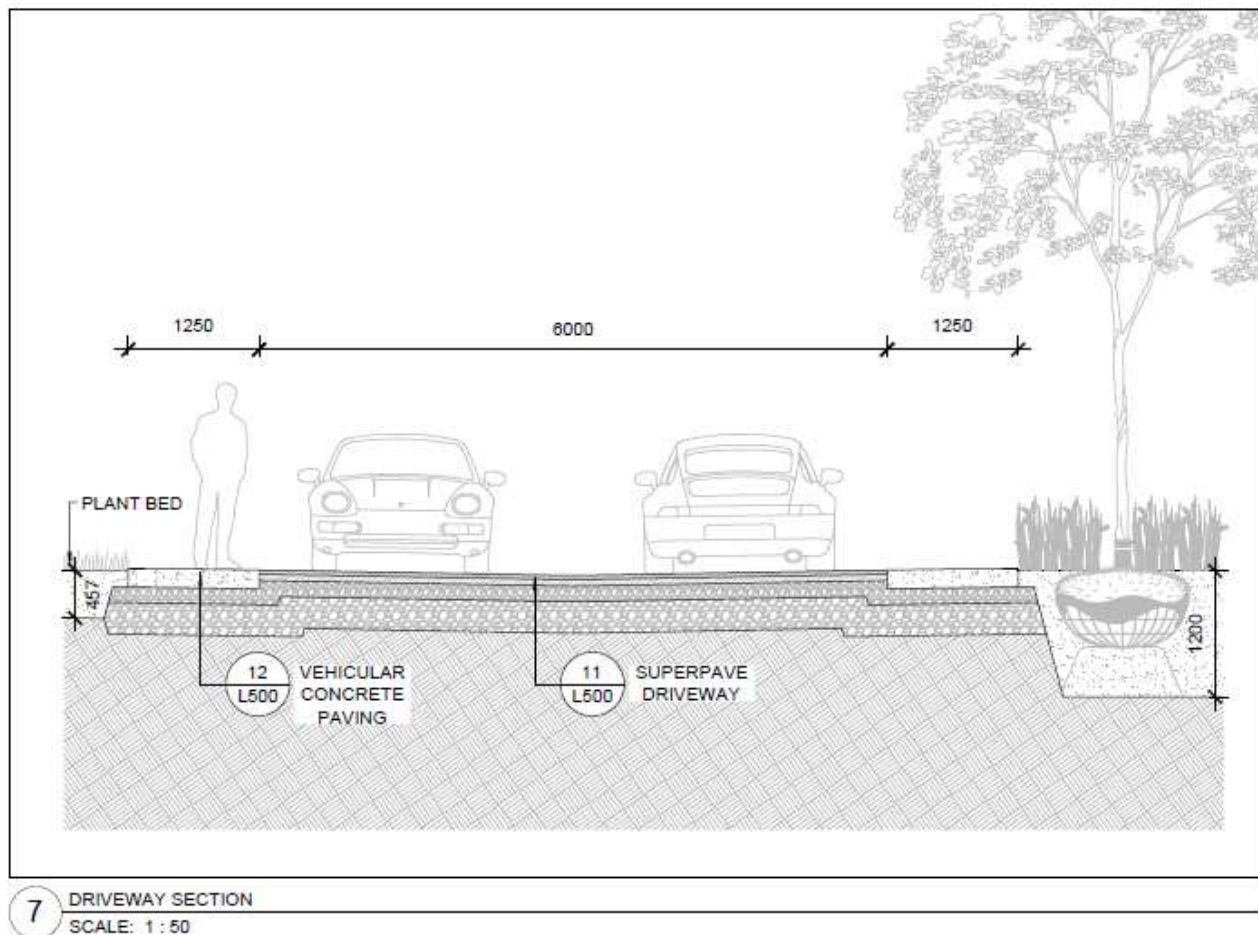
Cross section of the driveway at the entrance of the development. The woonerf measures 8.5-metres and is made up of two 1.25-metre vehicular concrete paving sections and a 6-metre superpave driveway. The woonerf narrows to 6-metres around the central landscaped area, where it is made up of two 1.25-metre vehicular concrete paving sections and a 3.5 metre superpave driveway. Source: - Landscape Sections, Plans L400, prepared by Janet Rosenberg & Studio, dated August 31, 2022, revision 11 dated May 9, 2025.
